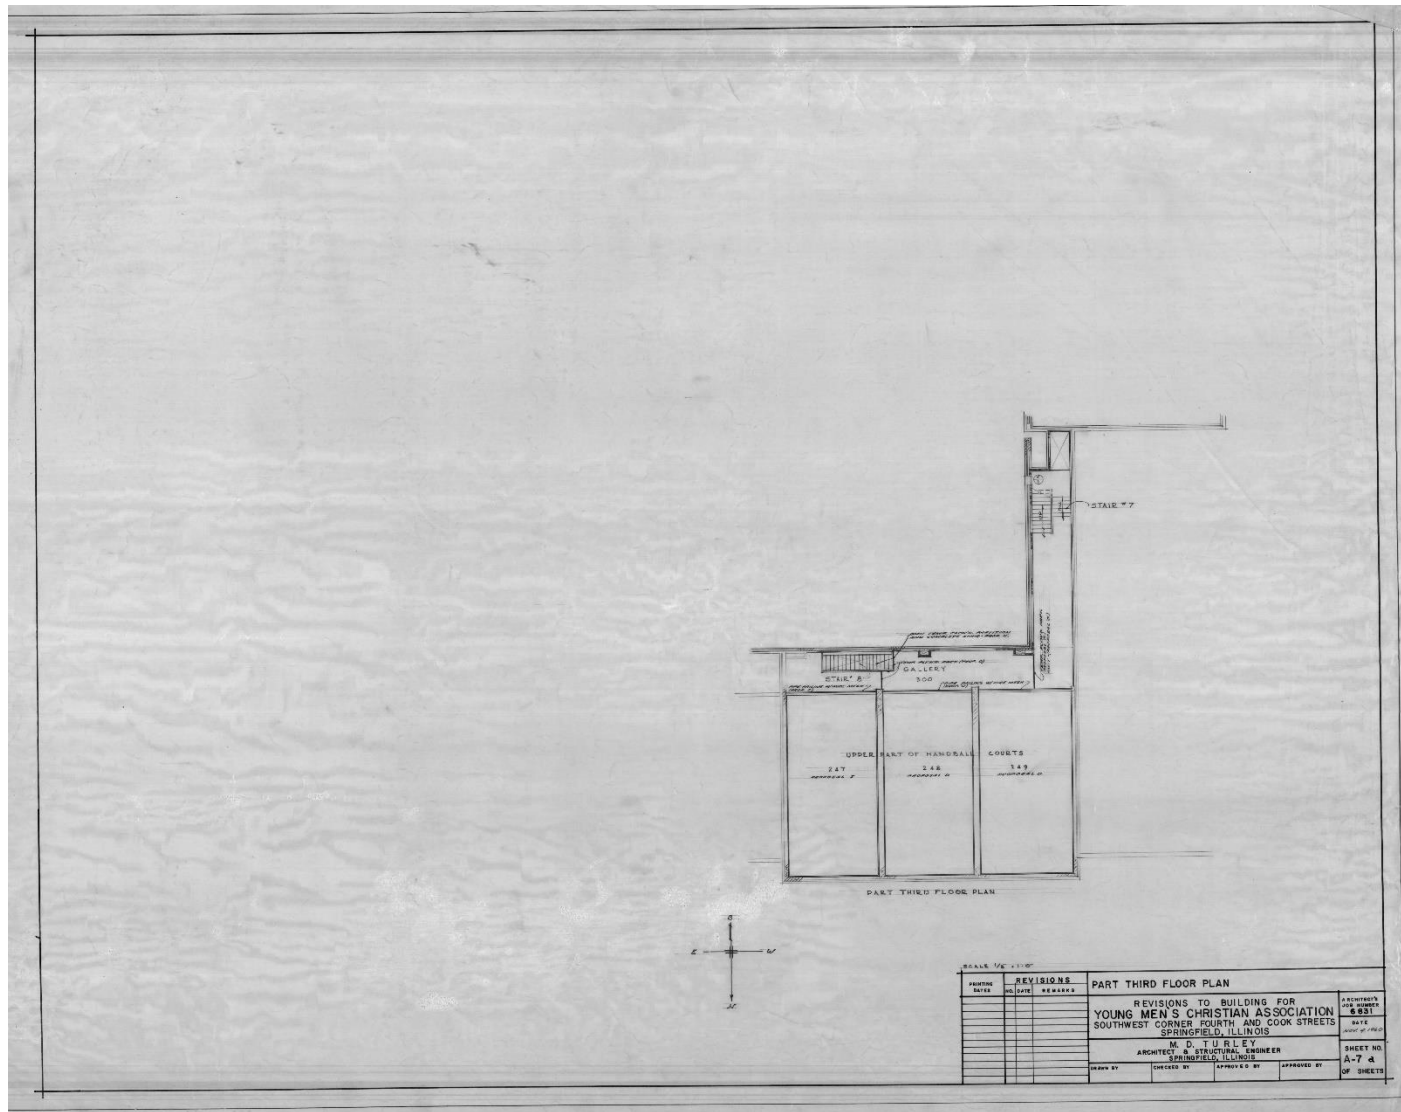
Part Third Floor Plan (Turley 1960; Sheet No. A-7a) [November 4, 1960].
